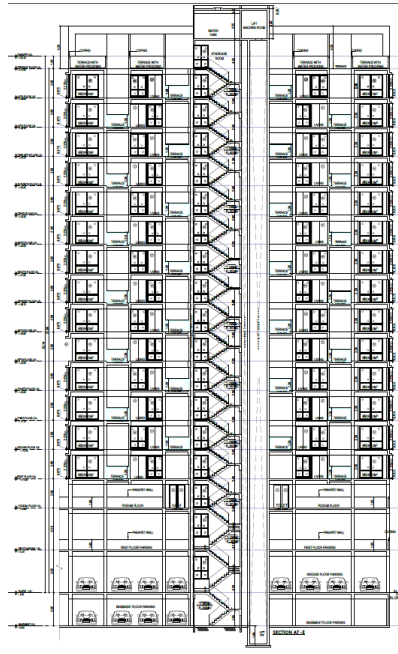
; Plan of G+20 Multi-Storey Building with Basement, 3 podium Floor and 14 storey (Including future expansion).
